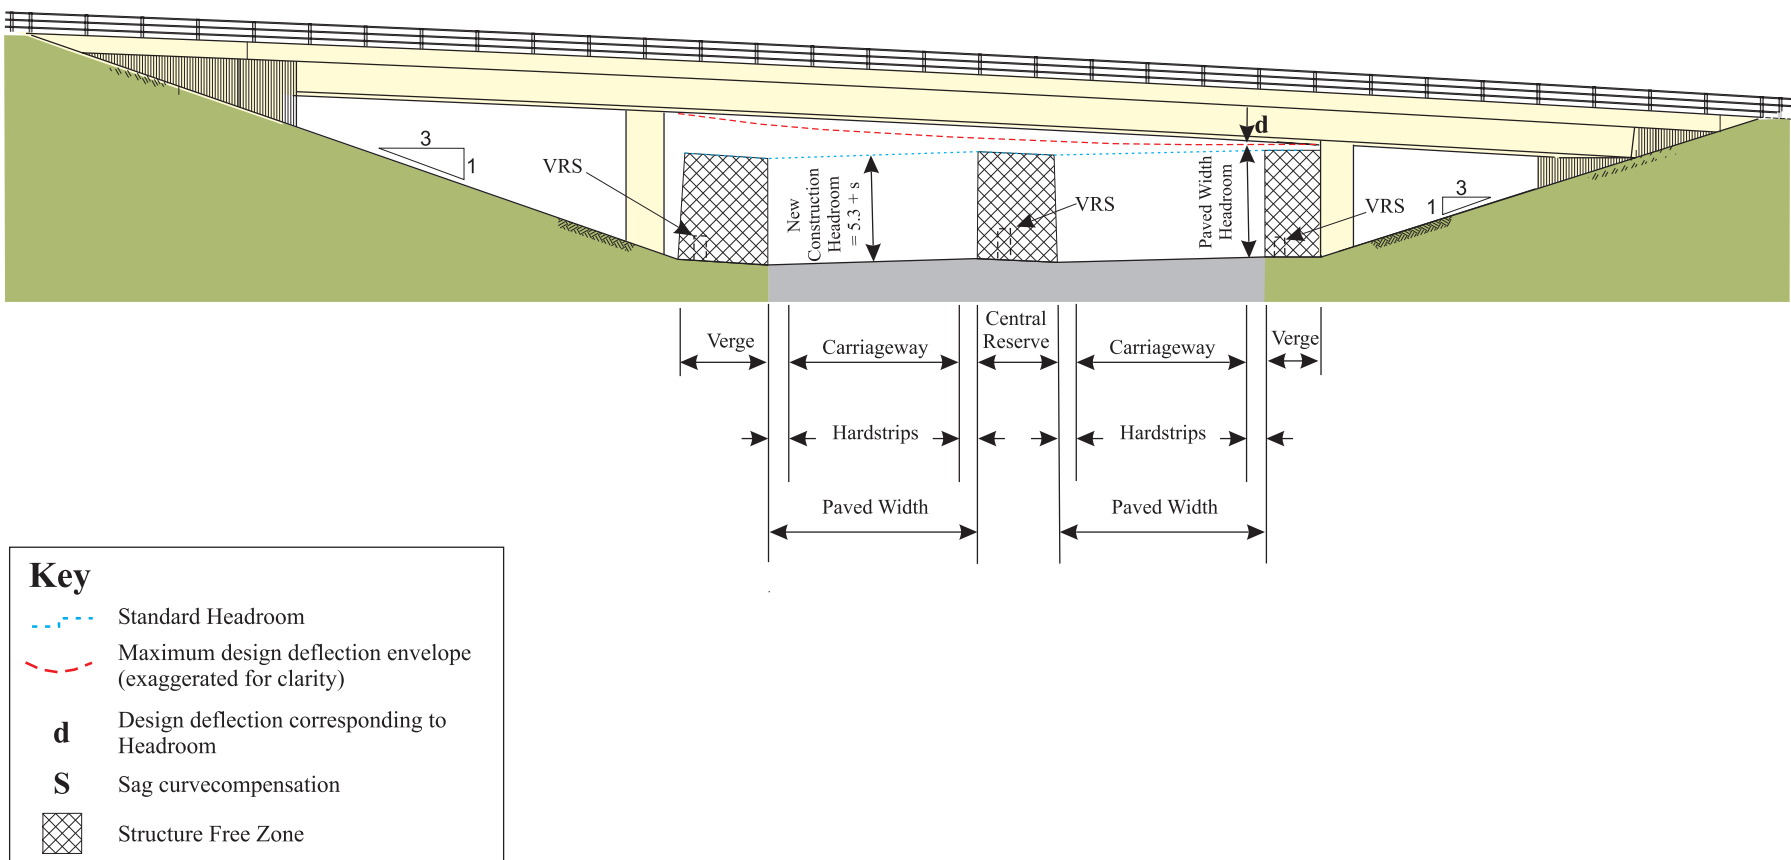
Headroom and Structure for a Three Span Structure Crossing a Dual Carriageway
